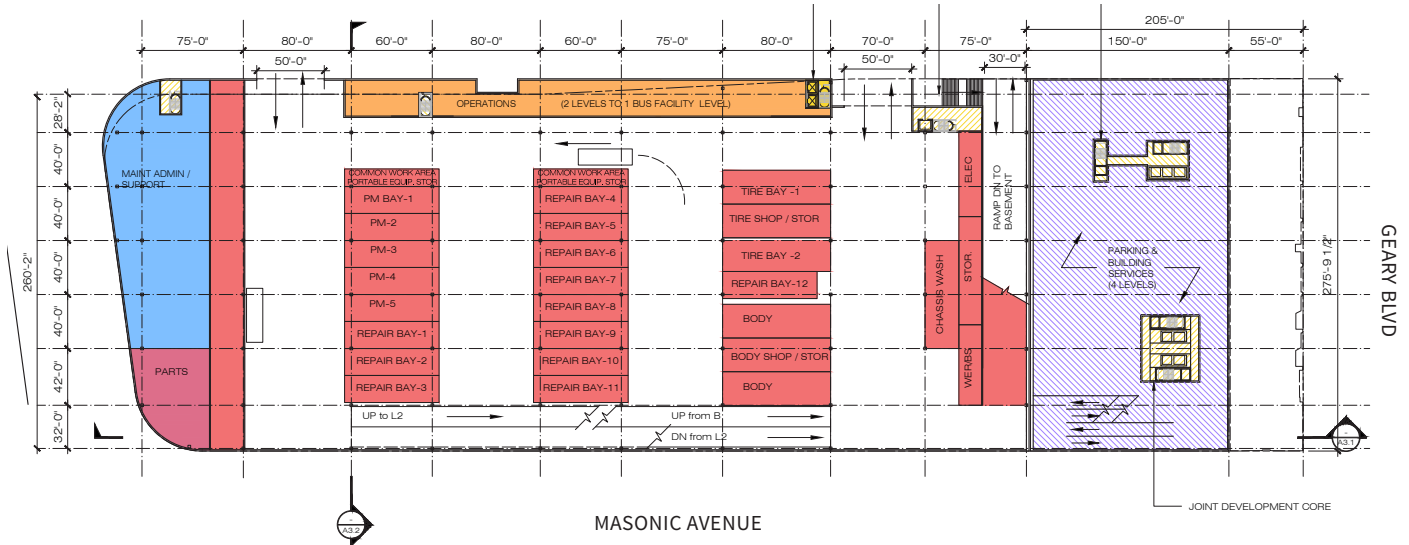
BUS FACILITY CONCEPT DESIGN - GROUND LEVEL PLAN
